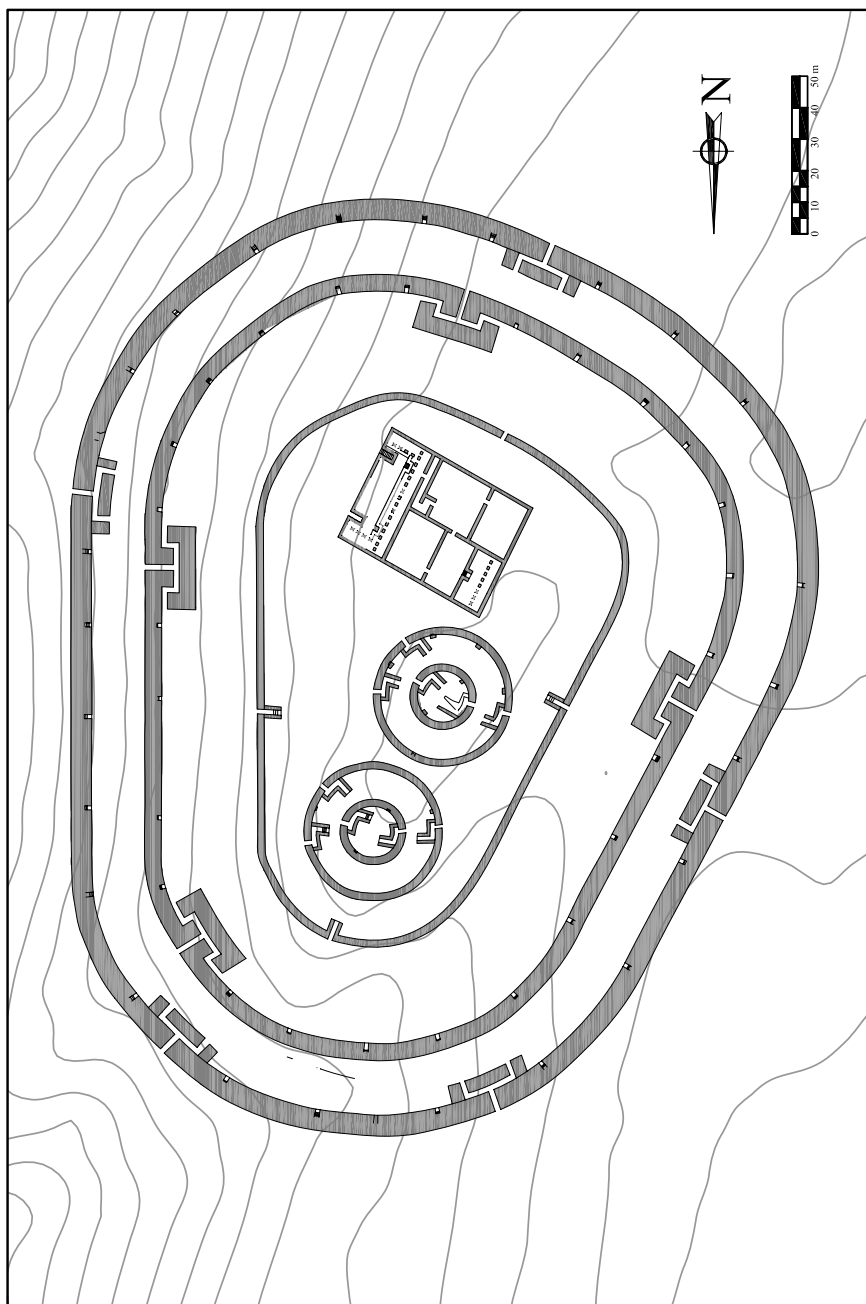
Ground plan of the hilltop building at Chankillo.
